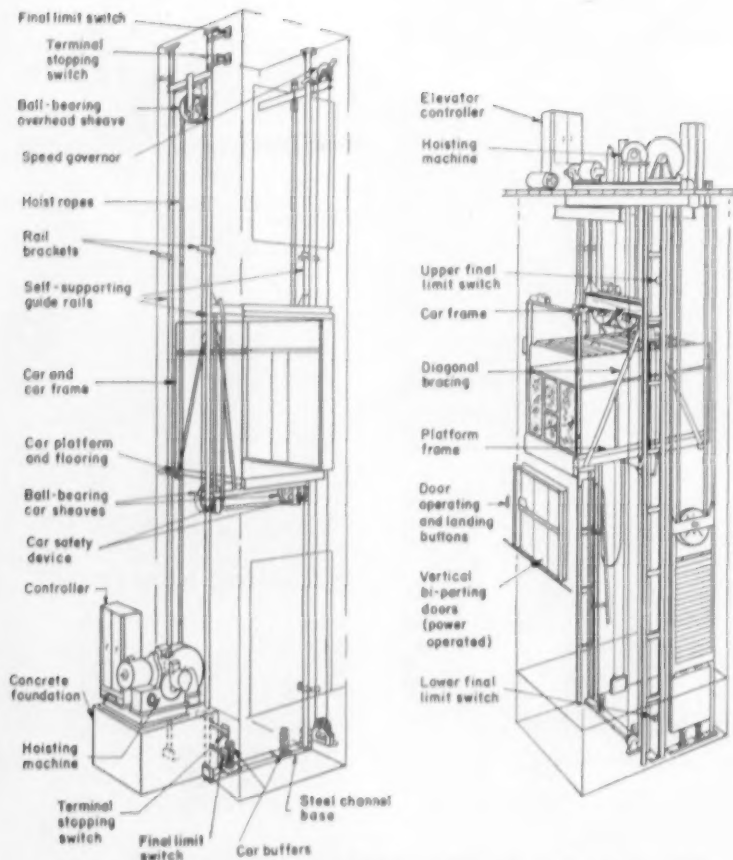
TWO MODERN ROPE HOIST ELEVATORS
